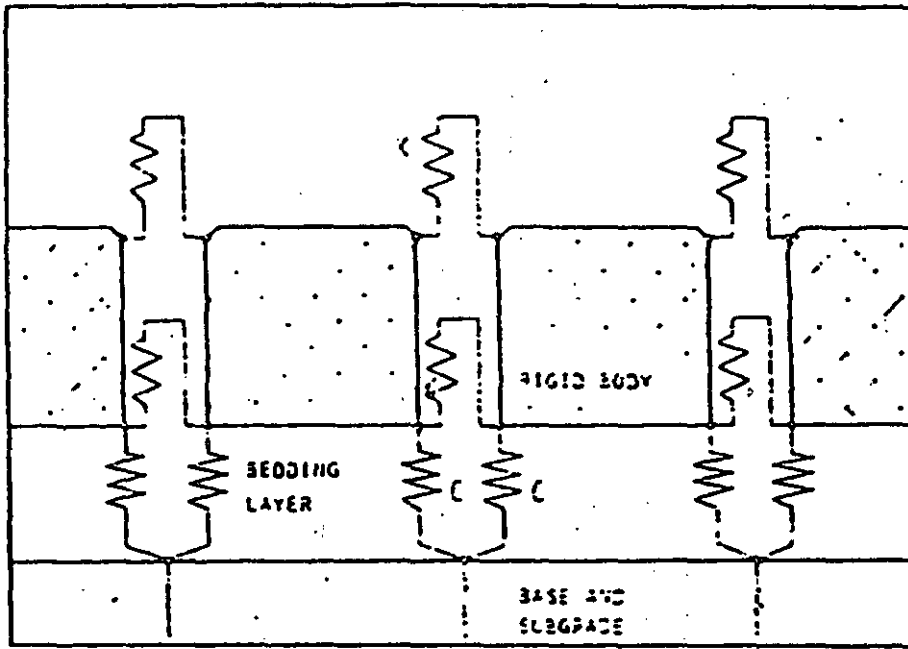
Modelling the concrete block pavement, (after Reference 6)
